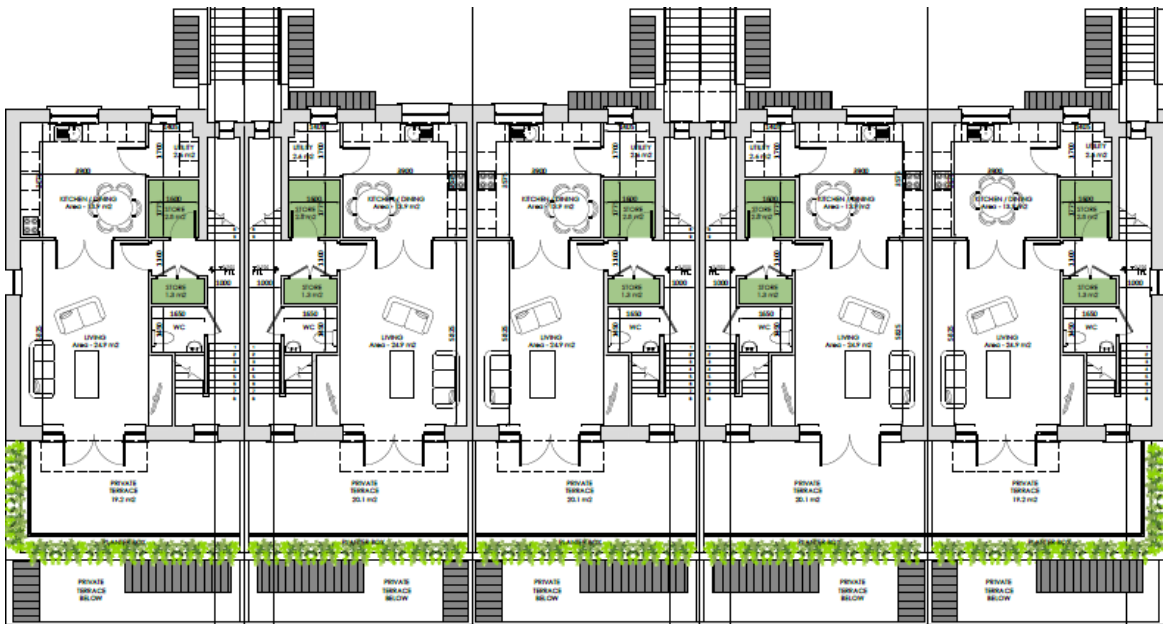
Proposed first floor plan of Duplex Apartment Block G.
